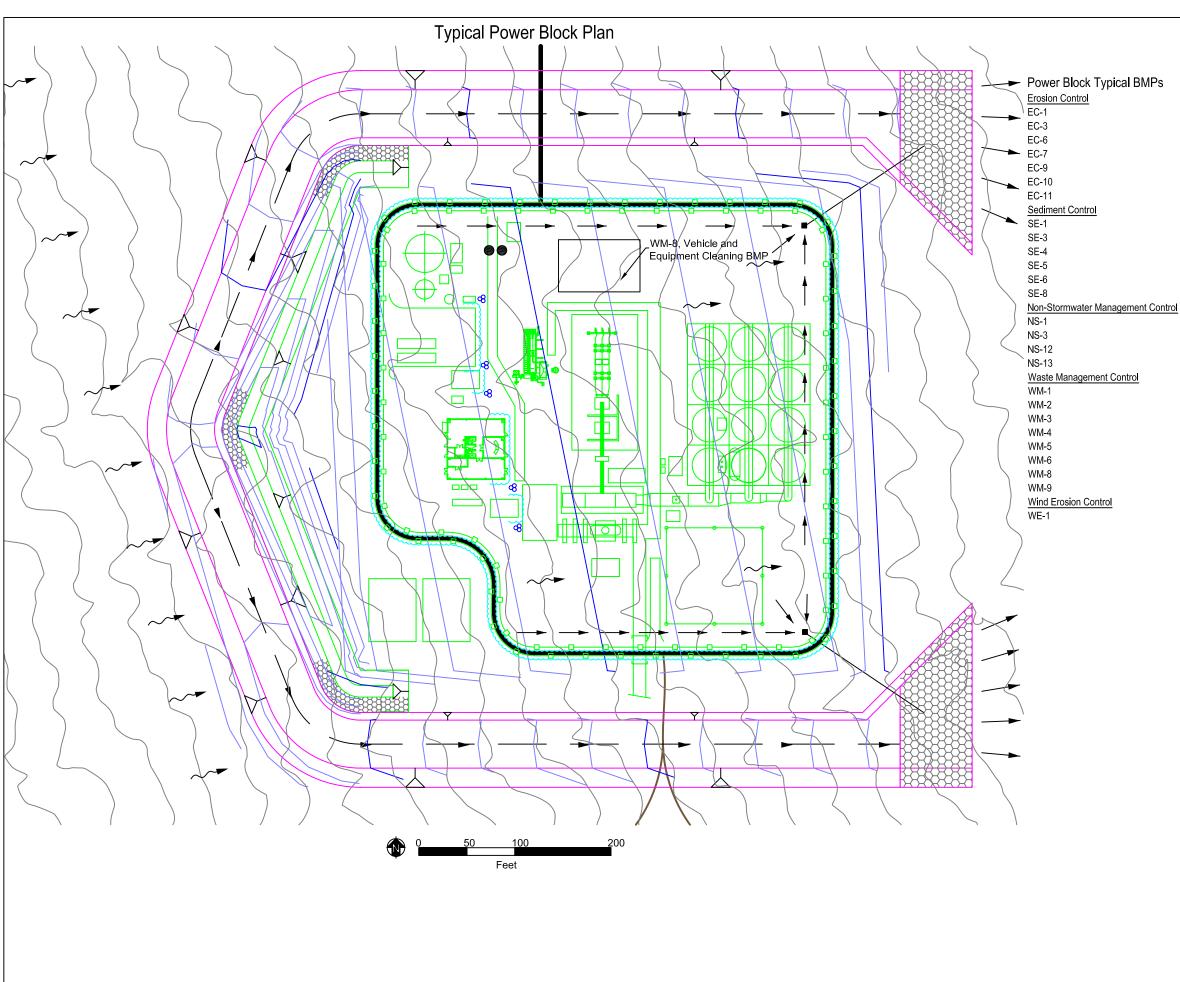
IVANPAH 1 POWER BLOCK LAYOUT PLAN
